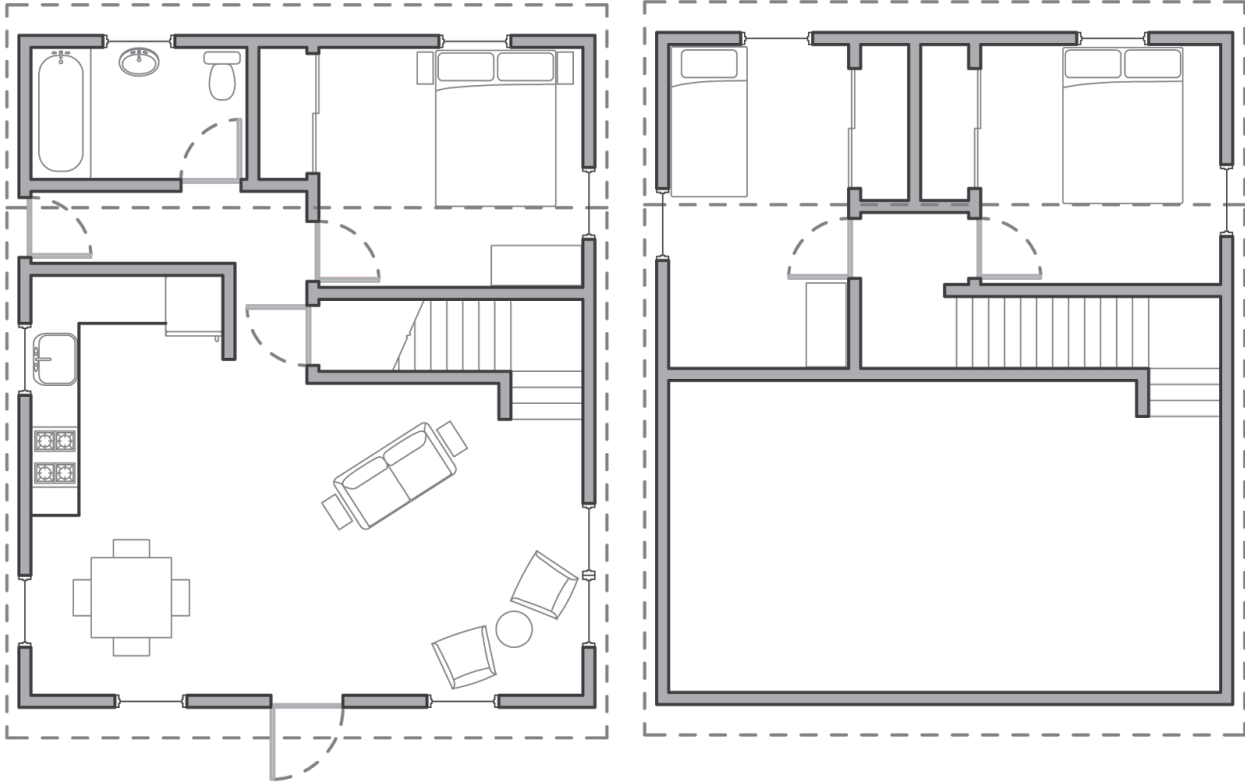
Saltbox Floor Plans - Ground Floor and Second Floor (Author 2015)
